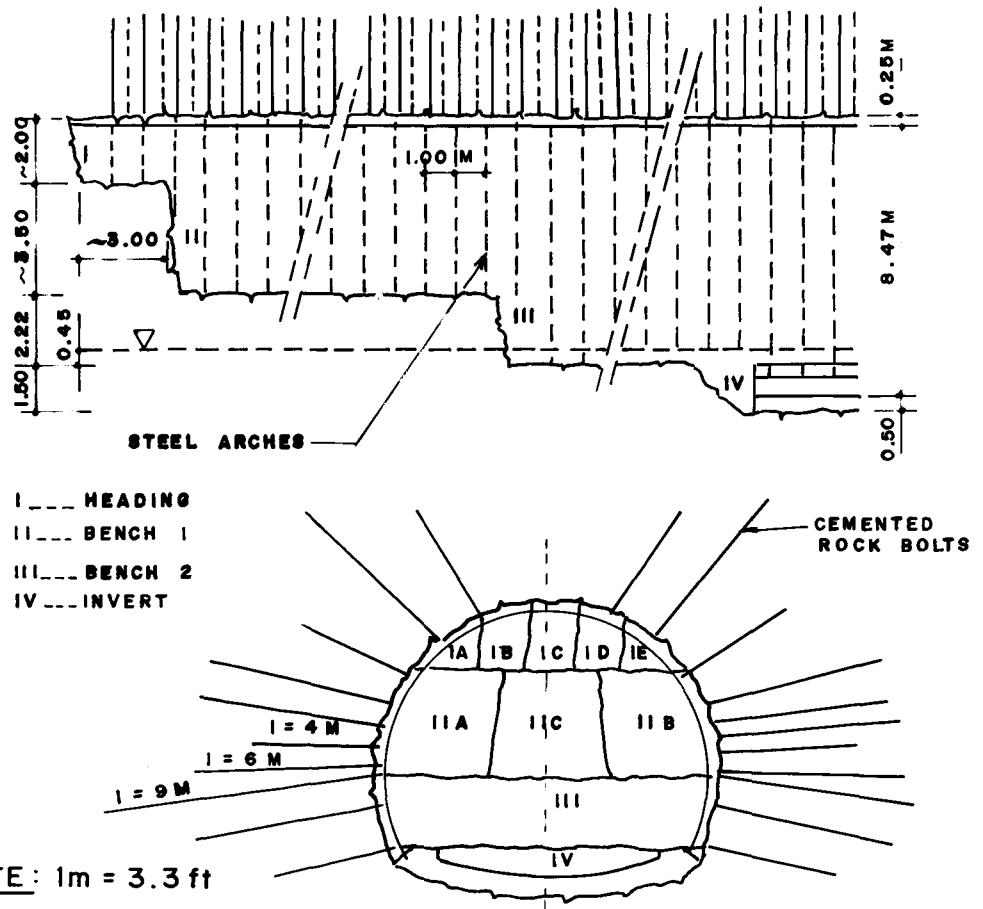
Construction Stages in the Fractured Zone of Perjen Tunnel (John, 1981)
